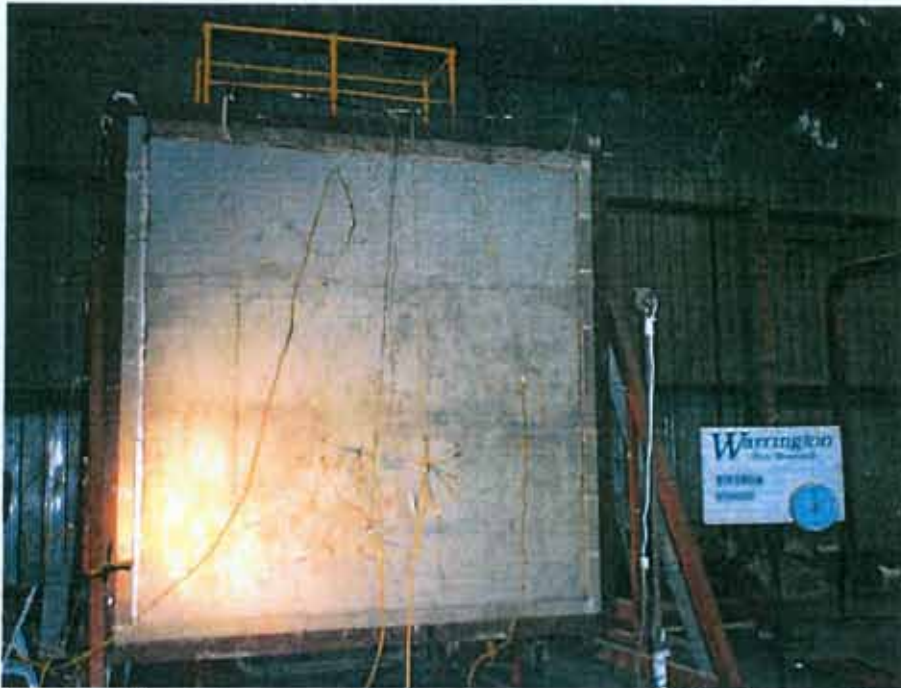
Unexposed face of test specimen after approximately 120 Minutes Test Duration.
